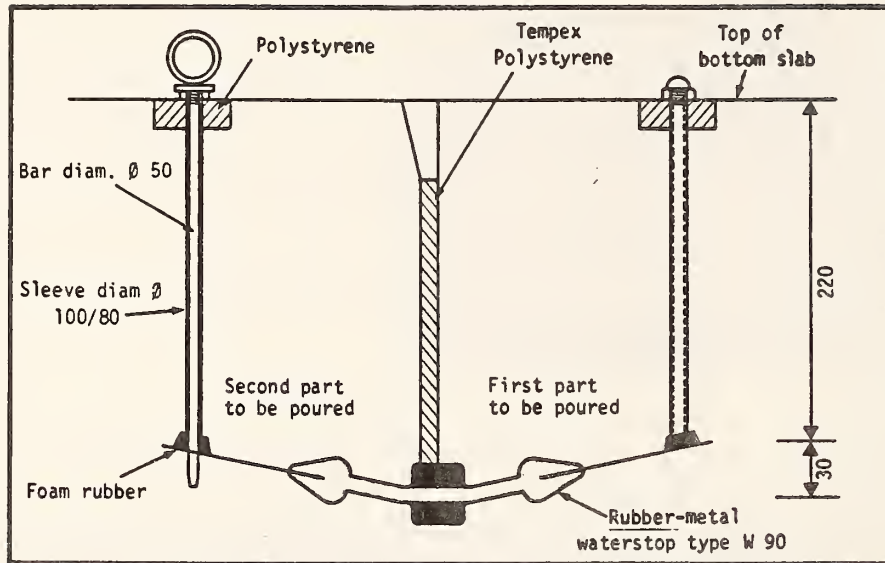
Detail A - EXPANSION JOINT WITH DUBBELDAM RUBBER STRIP
